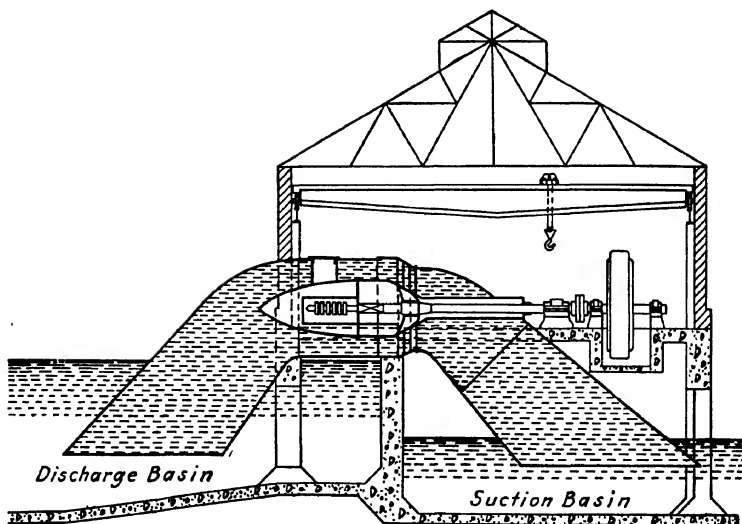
Method of setting 12-foot Wood screw pump at New Orleans, La.
